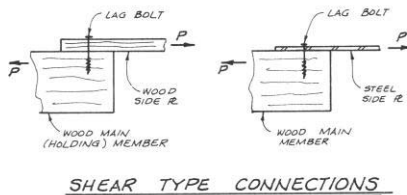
Lag bolt: Large-diameter fastener with wood screw thread and bolt head. Also known as lag screw.
